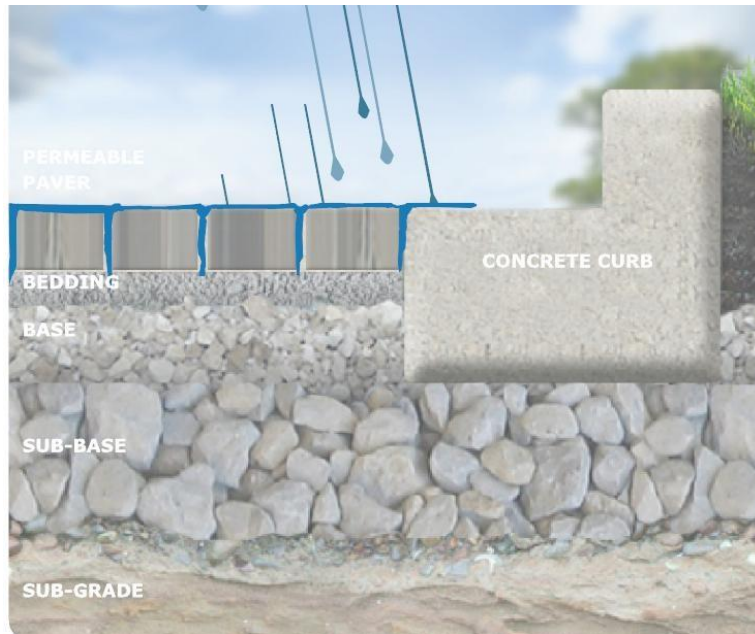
Example of a Permeable Paver Parking Lot Cross-Section (APT, 2011)
